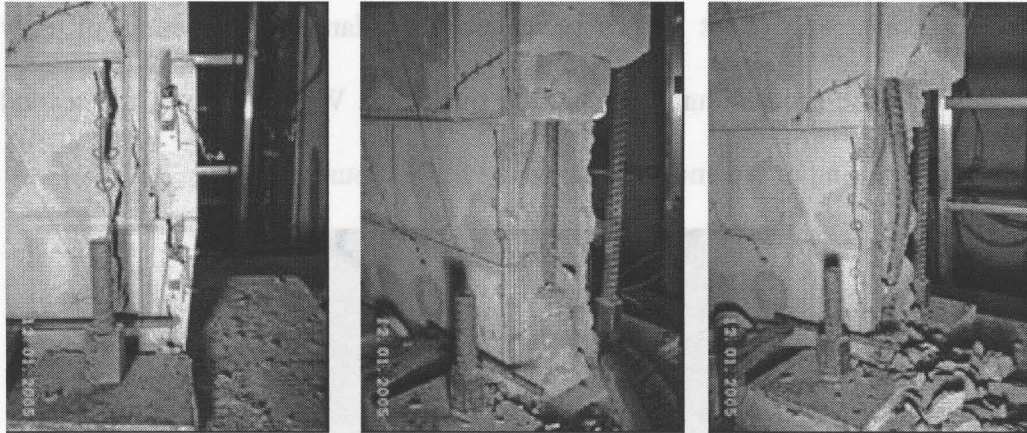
29: Cracking at toes of Wall 3 at 38 mm loading cycle
